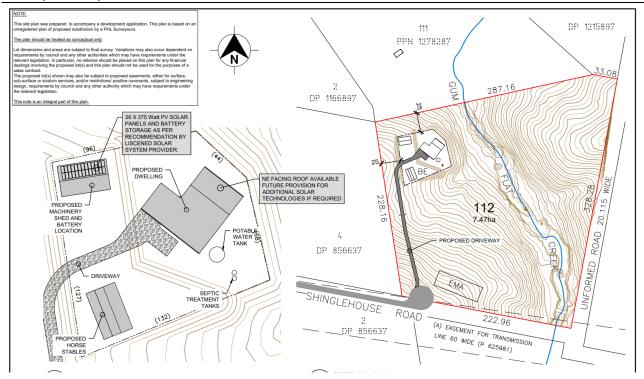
Indicative site plan for proposed Lot 112, showing proposed locations of solar panels and battery
